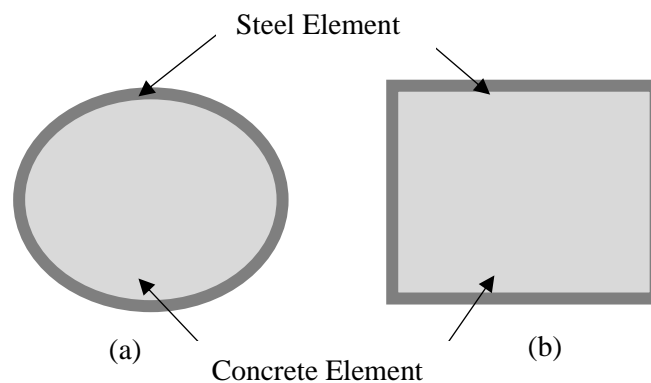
Concrete filled steel tubular (CFST) column (a) Circular CFST column (b) square CFST column
